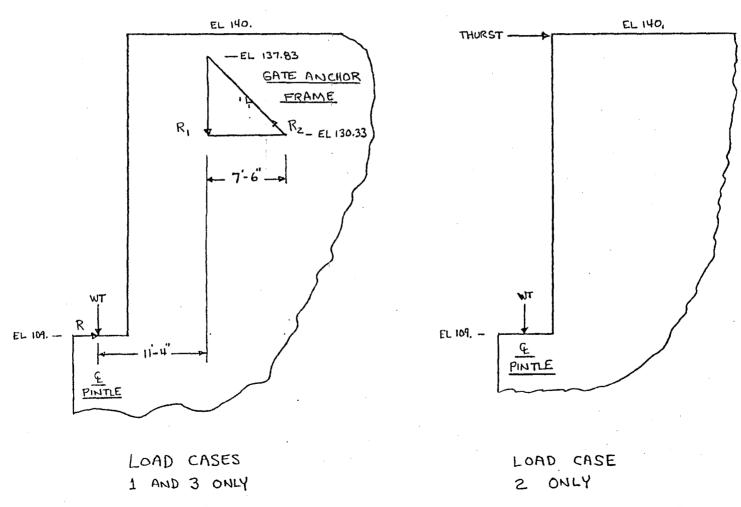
Gate Loads, Load Cases 1-3, Section E-E, Monolith No. 5.
